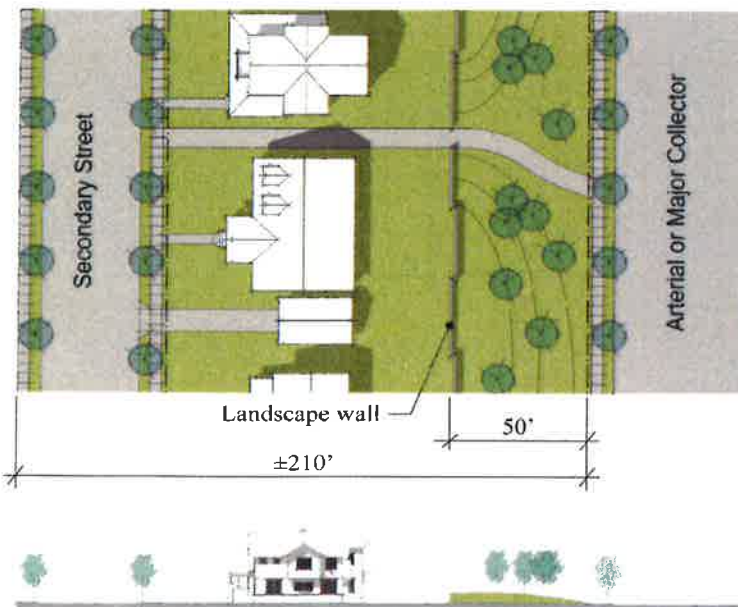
C.6: Building OrientationFront Facing (standard)
